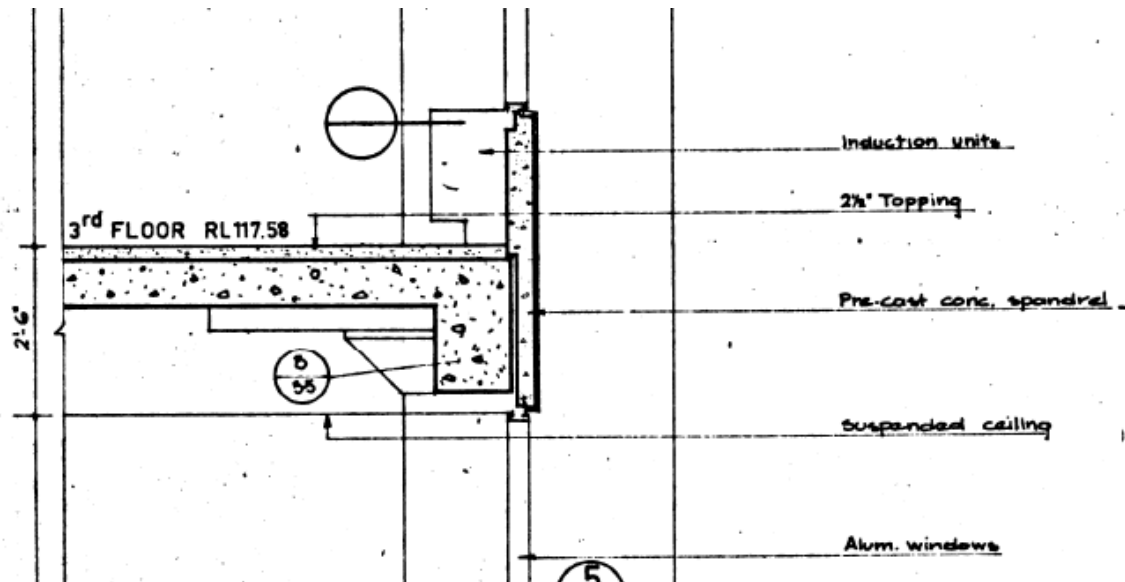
Drawing 38528-48, Building Application Plan, showing pre-cast concrete spandrel (BAP).
